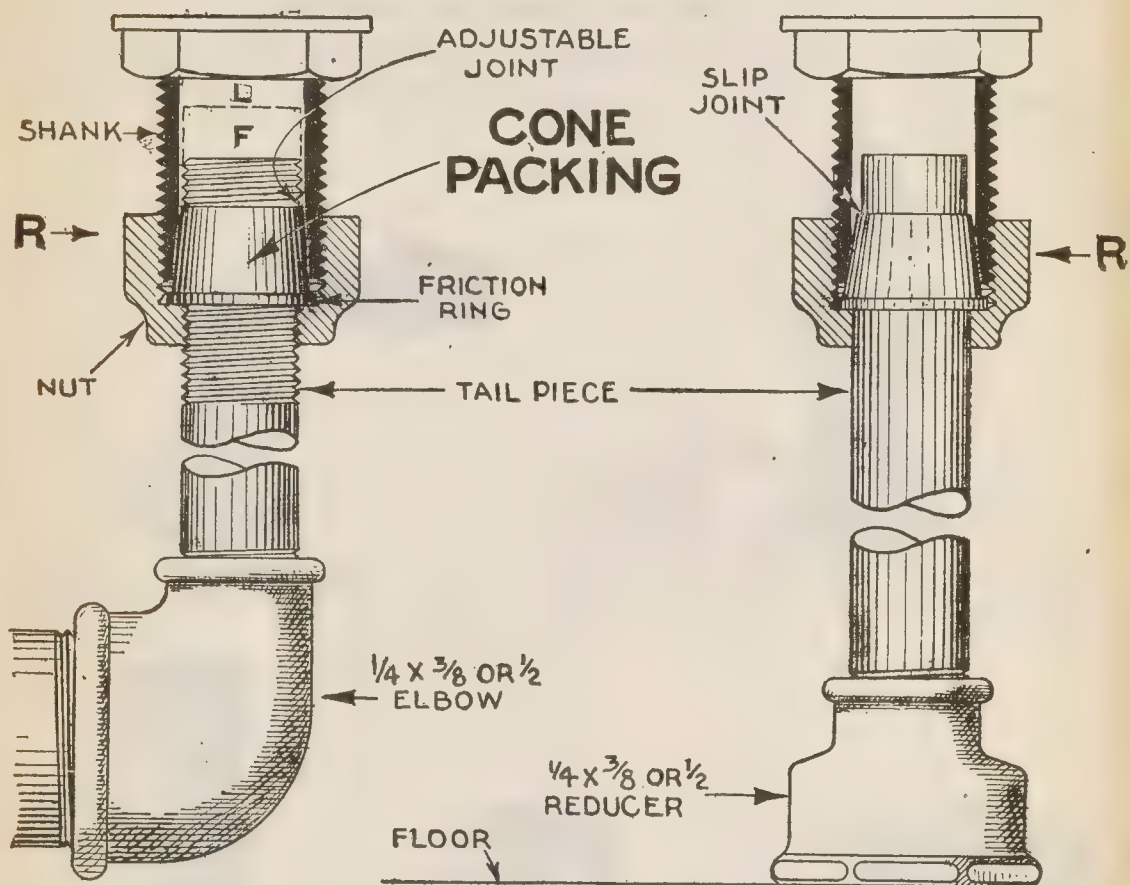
,468 and 7,469.—Wolverine lavatory faucet connections. Fig. 7,468, straight tail piece; fig. 7,469, 90° elbow tail piece with soft metallic adjustable cone joint and coupling nut.
